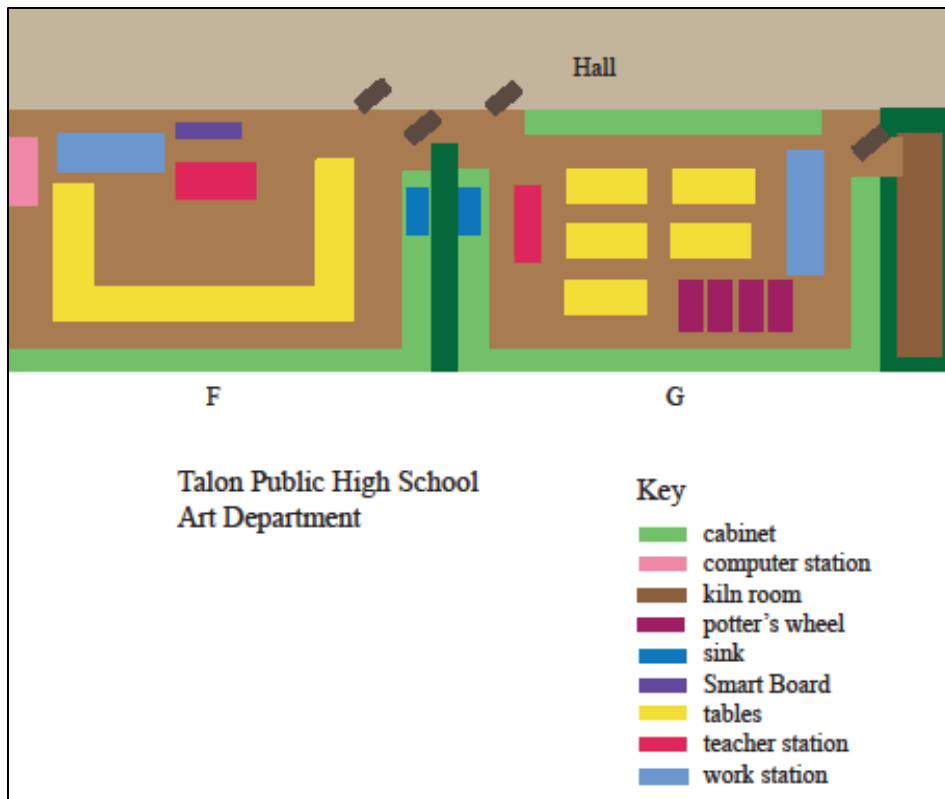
Floor plan for Laura's classroom, Talon Public High School Art Department
